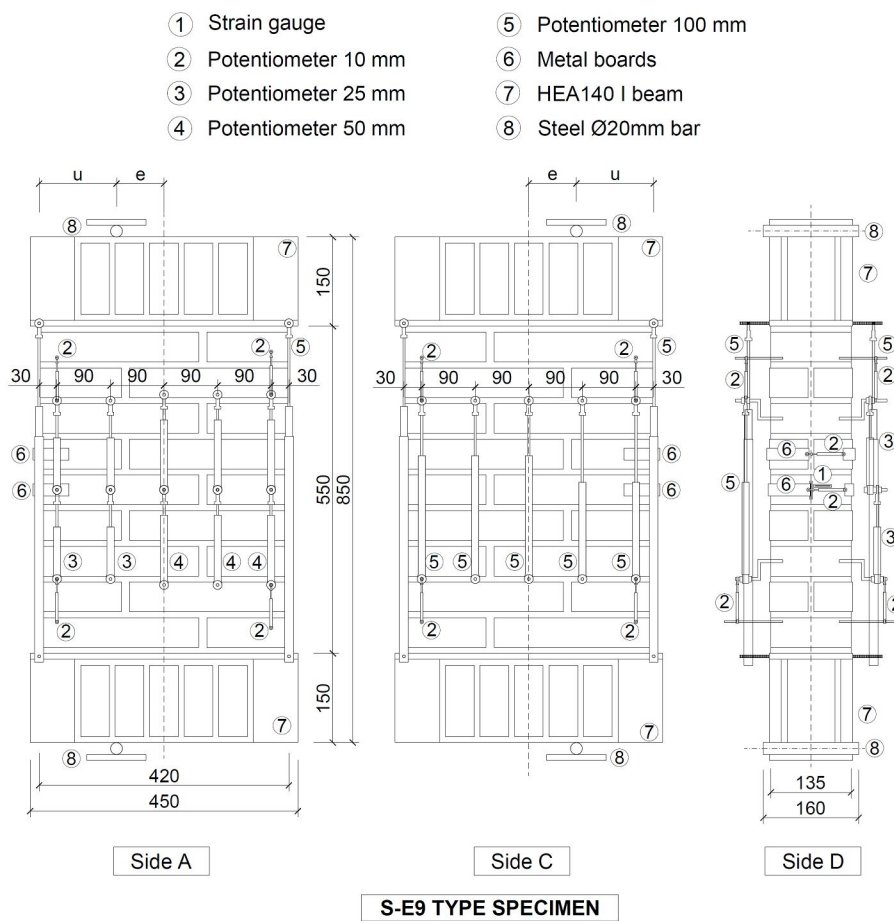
Schematic illustration of the equipment for eccentric axial load tests on S-E9 brickwork specimens.
